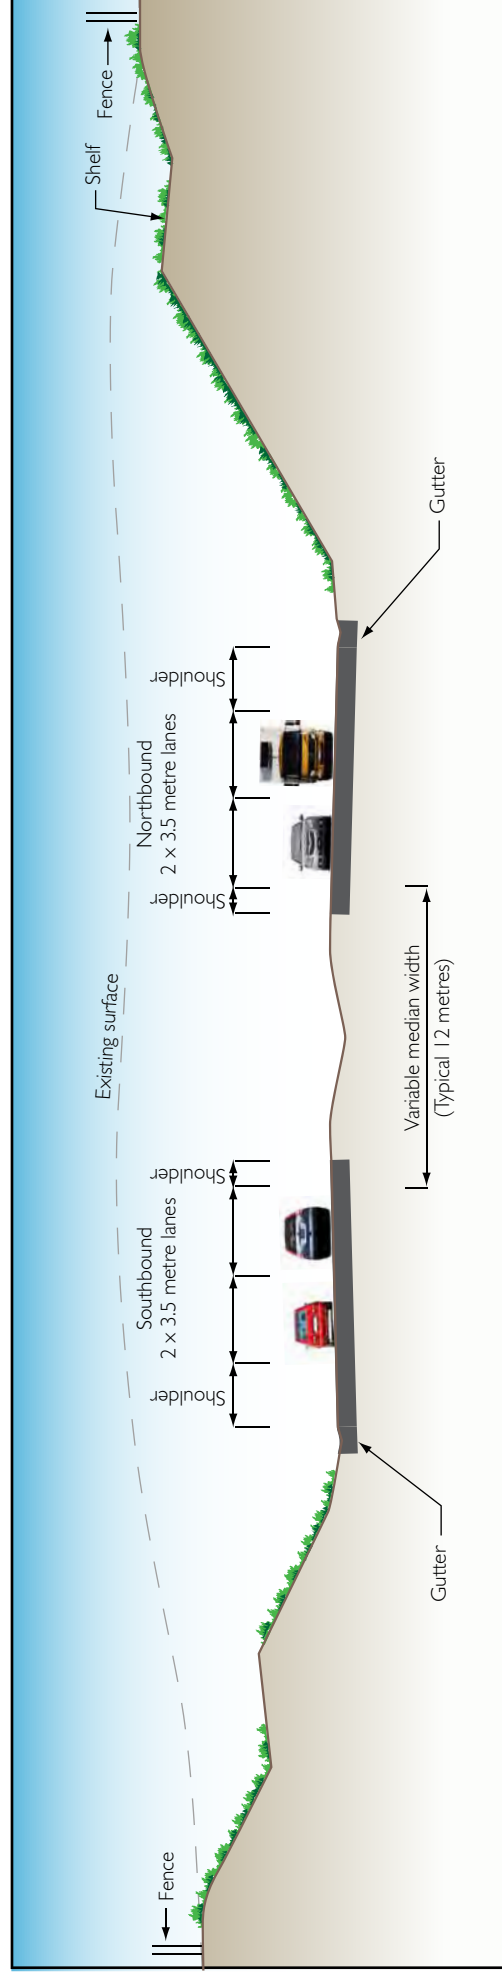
Indicative alignment cross-sections – embankment and cut
